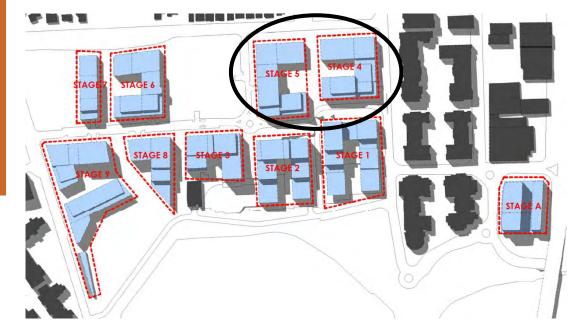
Extract from Indicative Staging Plan prepared by R&M Architects detailing the location of the Stage 4 and Stage 5 buildings
